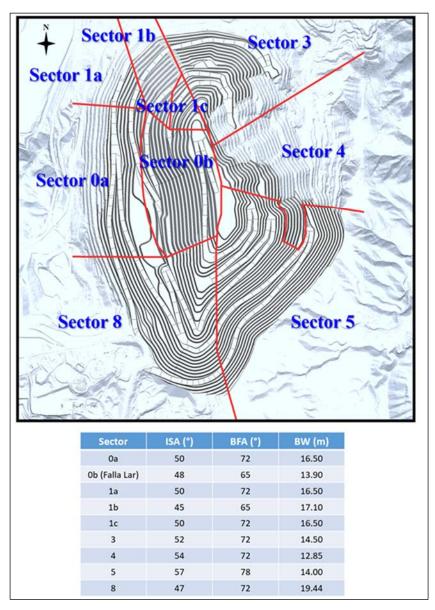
Candelaria Open Pit Sectors Geotechnical Design Recommendations
